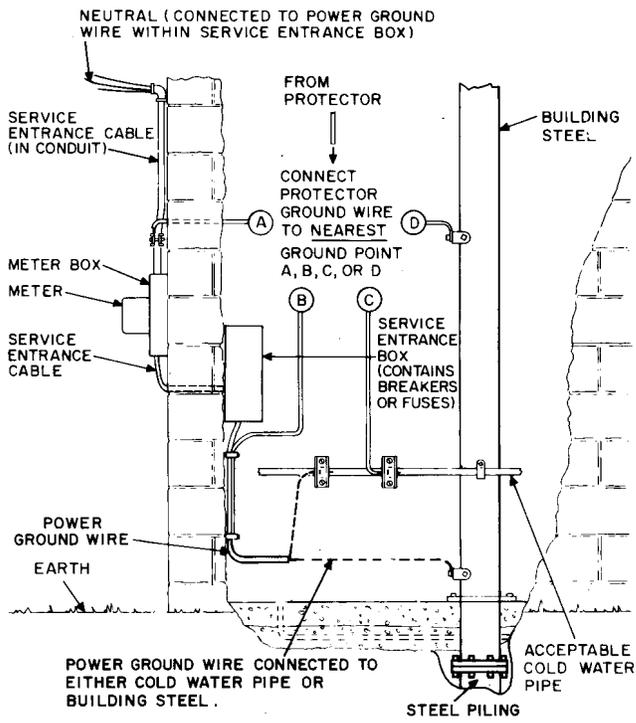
Acceptable Water System or Building Ground—Power Service Grounded to Cold Water Pipe or Building Steel
